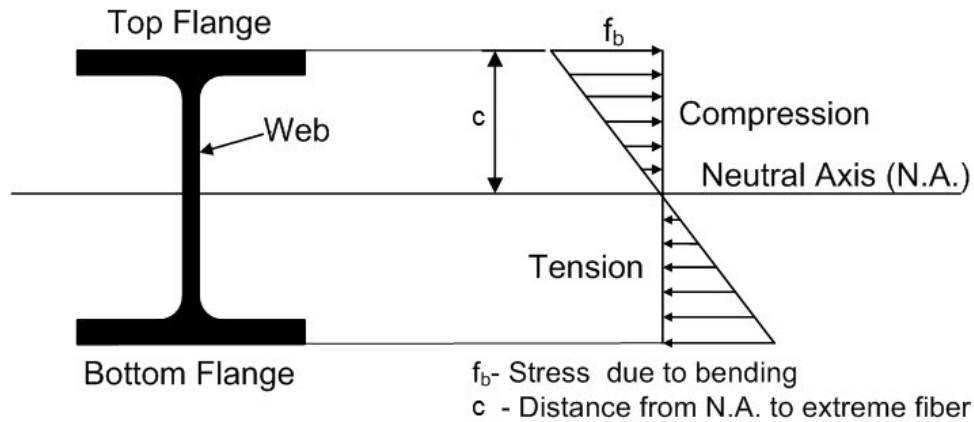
Girder Cross Section Resisting Positive Moment
